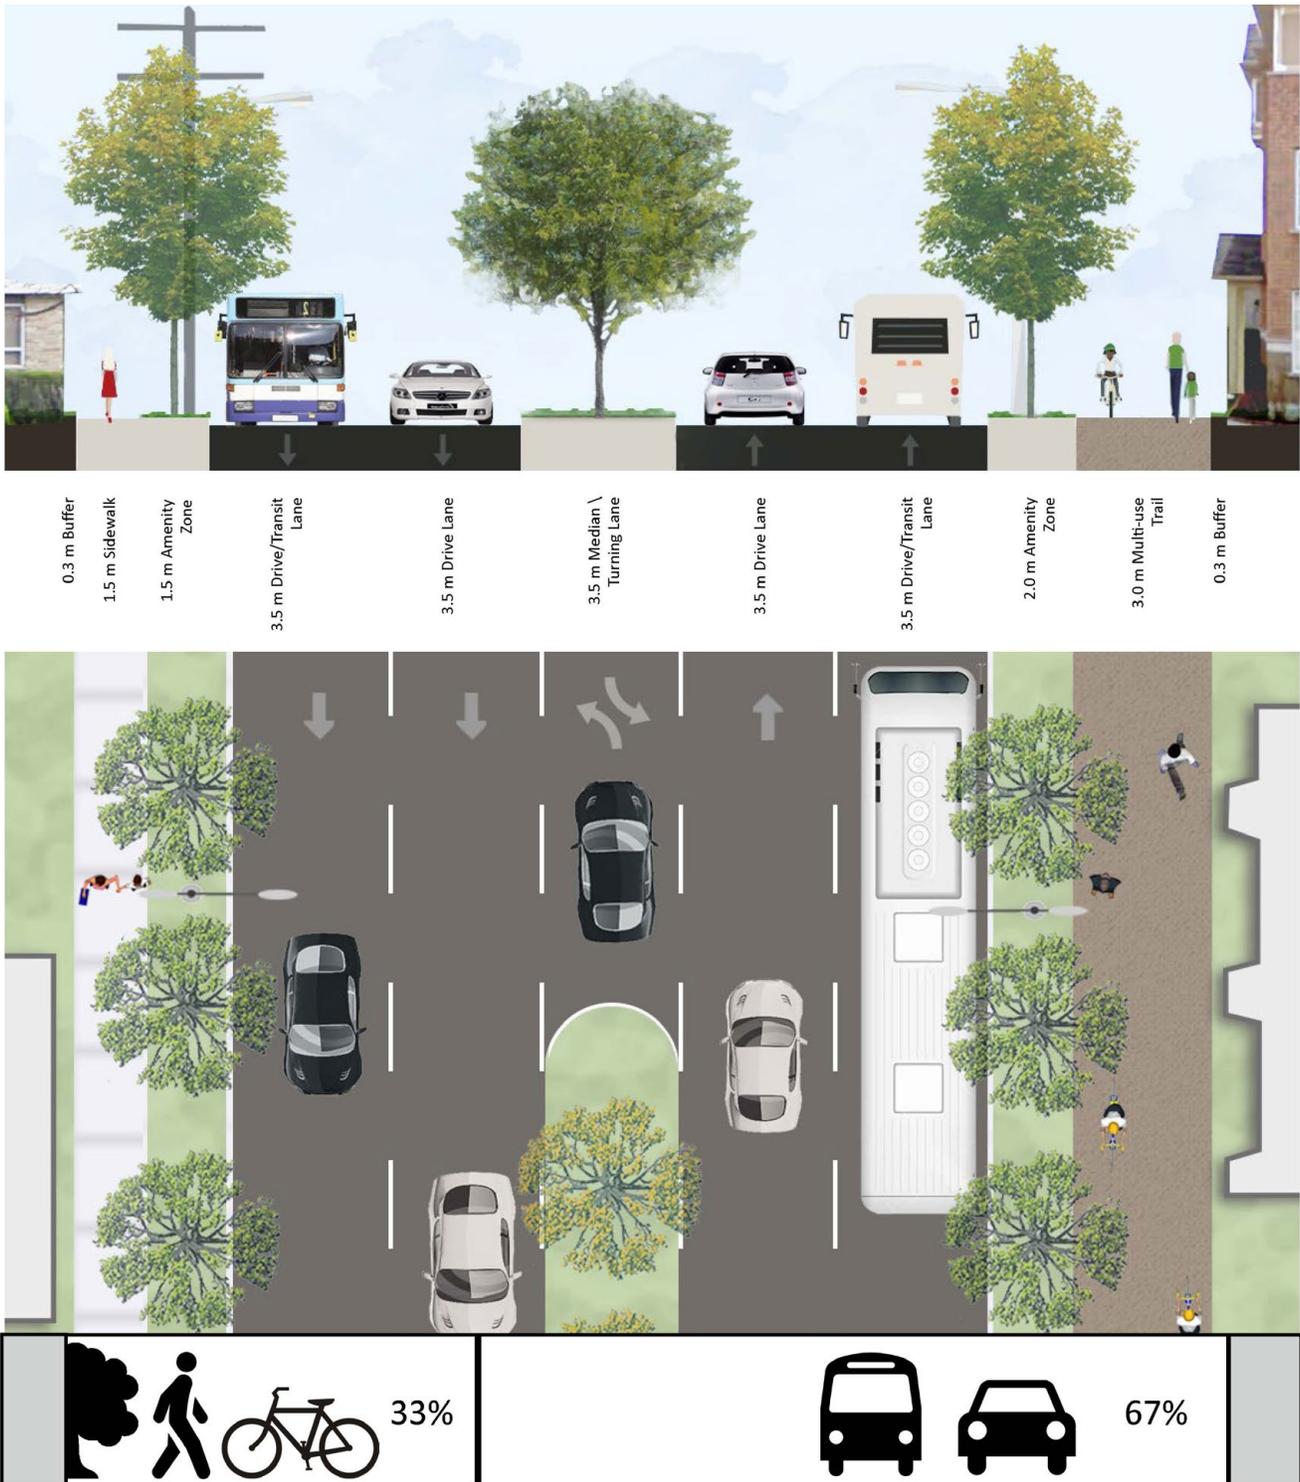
Conceptual Streetscape Section of a 26.2m ROW with a Multi-Use Path and Sidewalk
